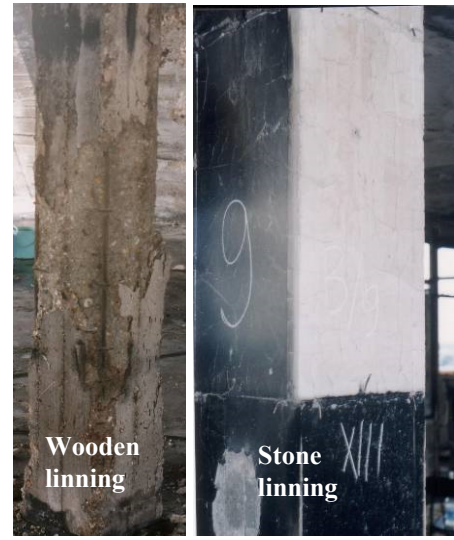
Influence of type of decorative layer type on the fire damage degree of concrete columns
